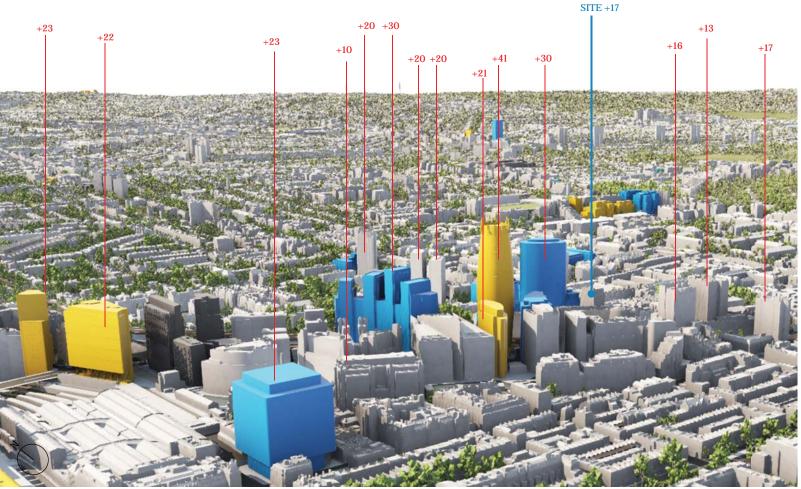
Existing and Emerging Context - Vlew looking North
